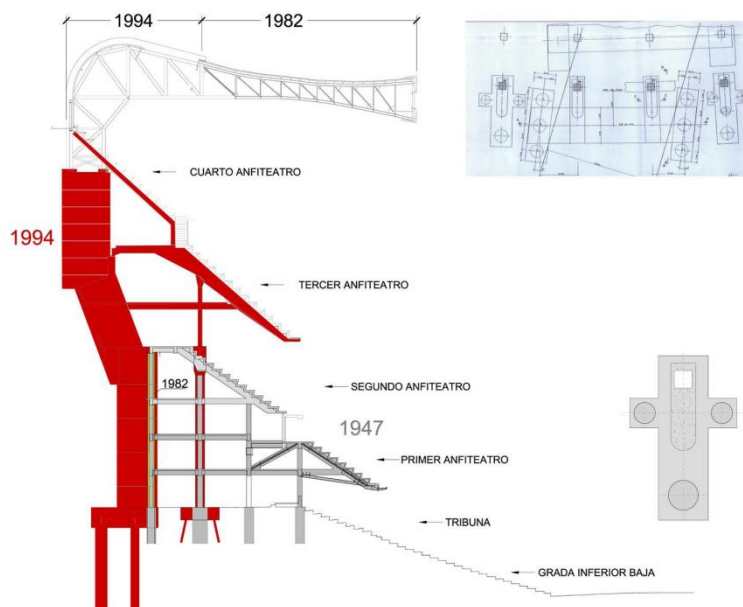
West cross-section and end areas after the 1994 expansion, foundation plan of a typical rib (bottom right) and reinforcement of the bridge structures over the tunnel on the south side (top right)
